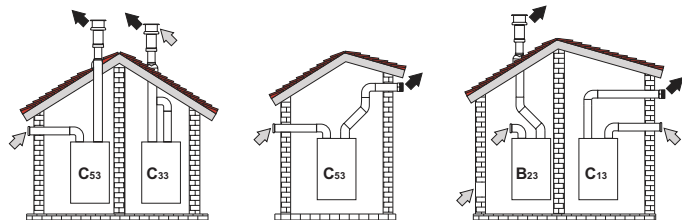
Examples of connection with separate pipes (⇨ = Air / ⇩ = Fumes)
